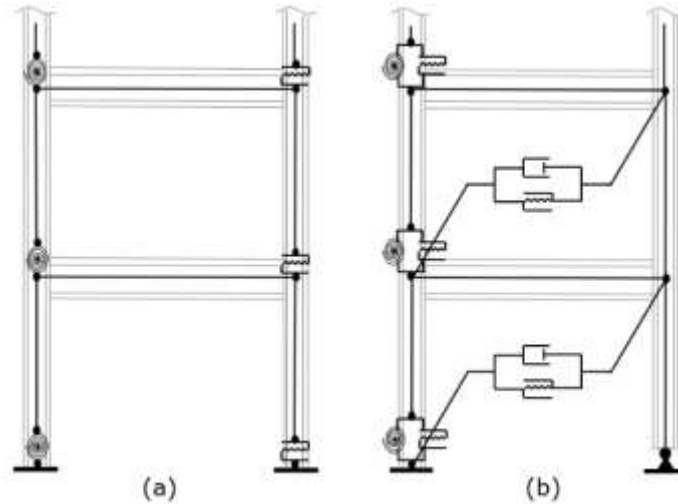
(a) A continuum model where a flexural cantilever beam and a shear cantilever beam are connected; (b) A further simplified ‘two-beam’ model with damping elements implemented
